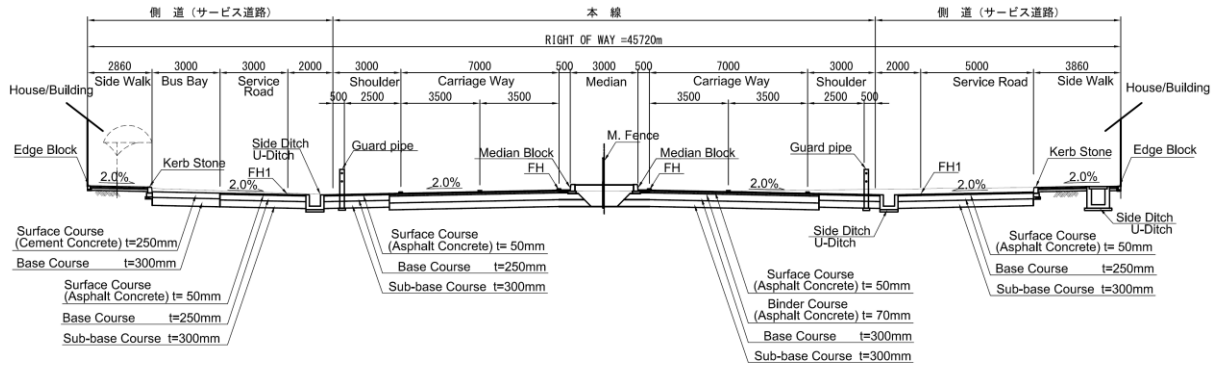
Drainage Facilities Where Service Tracks are Provided
